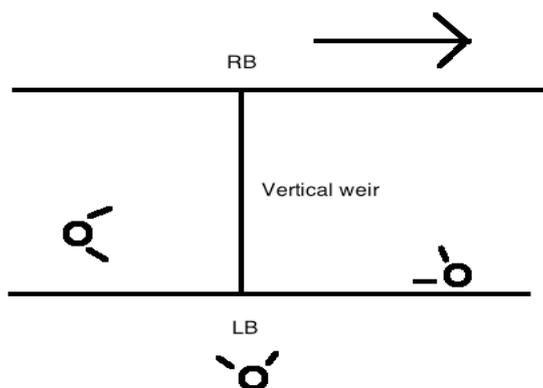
Site plan for Stafford Road Barrier 1
